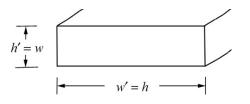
Bending about the more flexible dimension of a 2 by 6 beam
